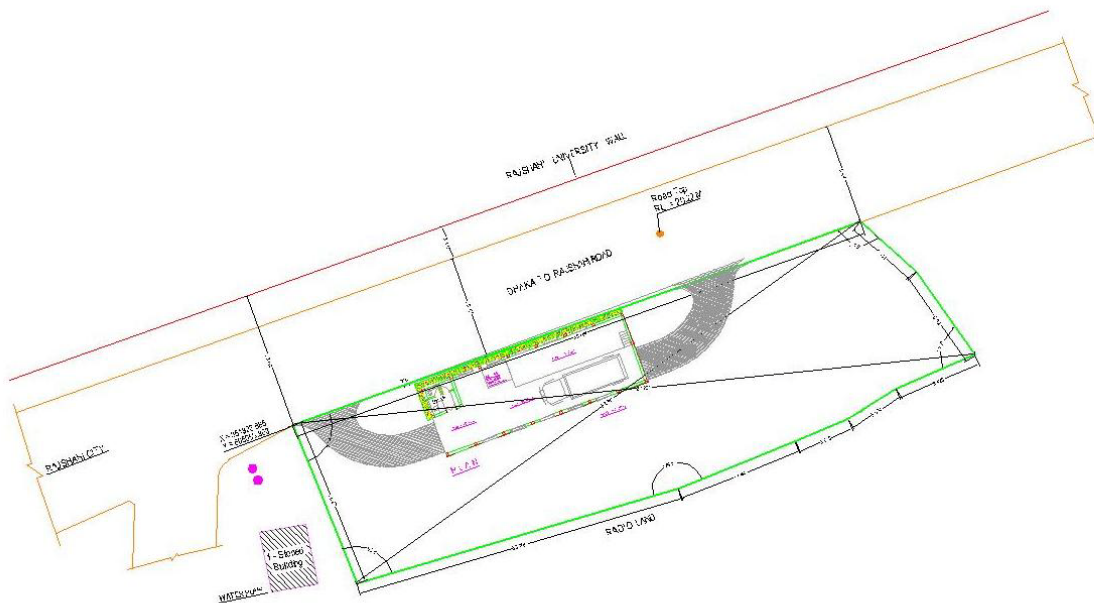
STS – 5 Talaimari Adarsha School Layout Plan (24°21'53"N, 88°37'33"E)
